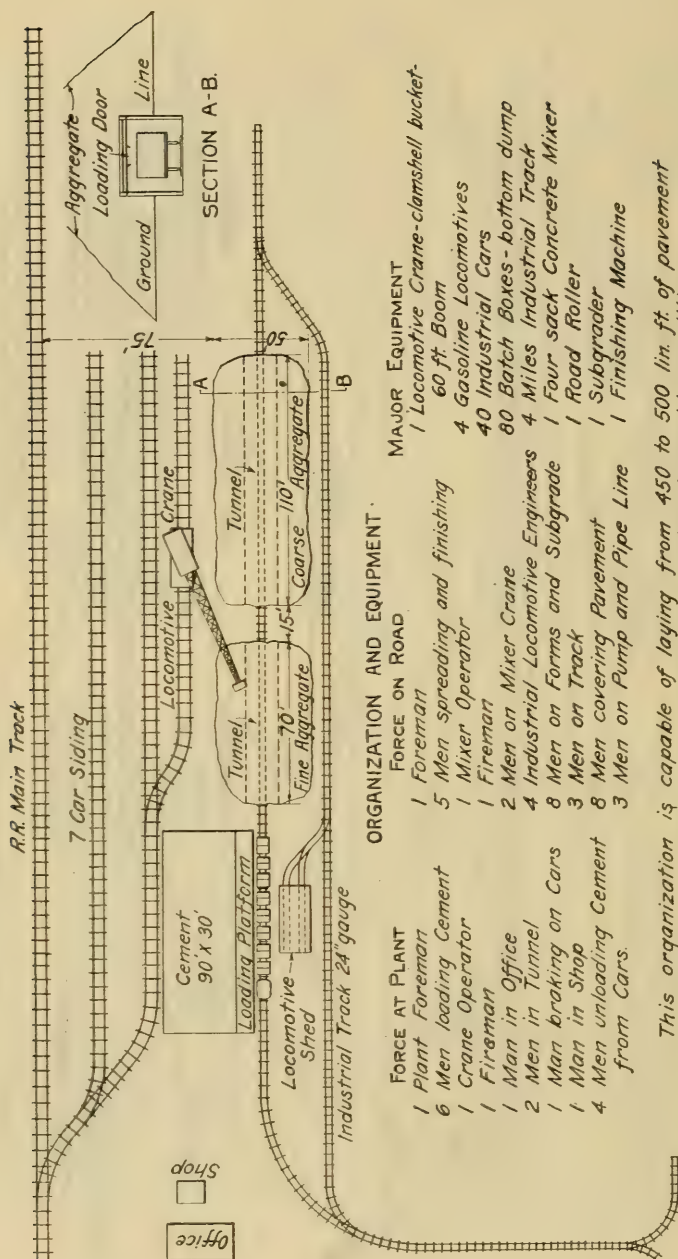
Typical organization and plant layout, central proportioning, tunnel loading, industrial haul.
